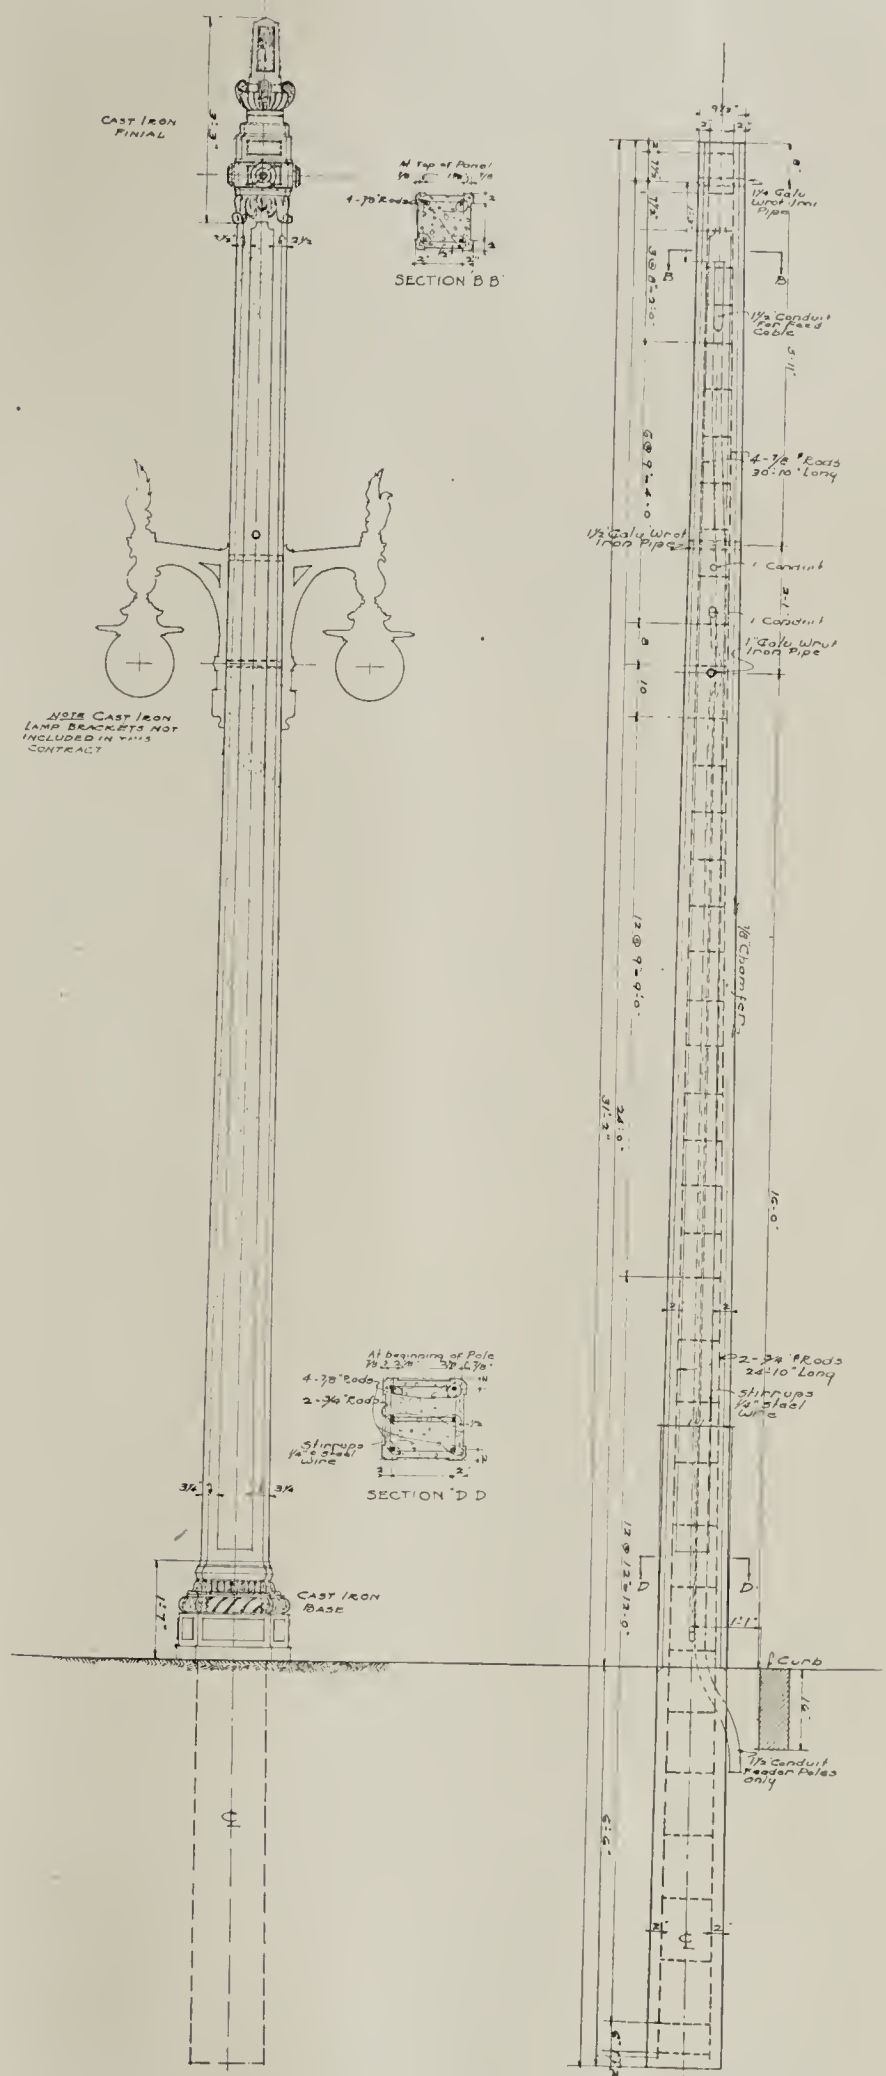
Elevation of Reinforced Concrete Trolley Poles Showing Reinforcement.
